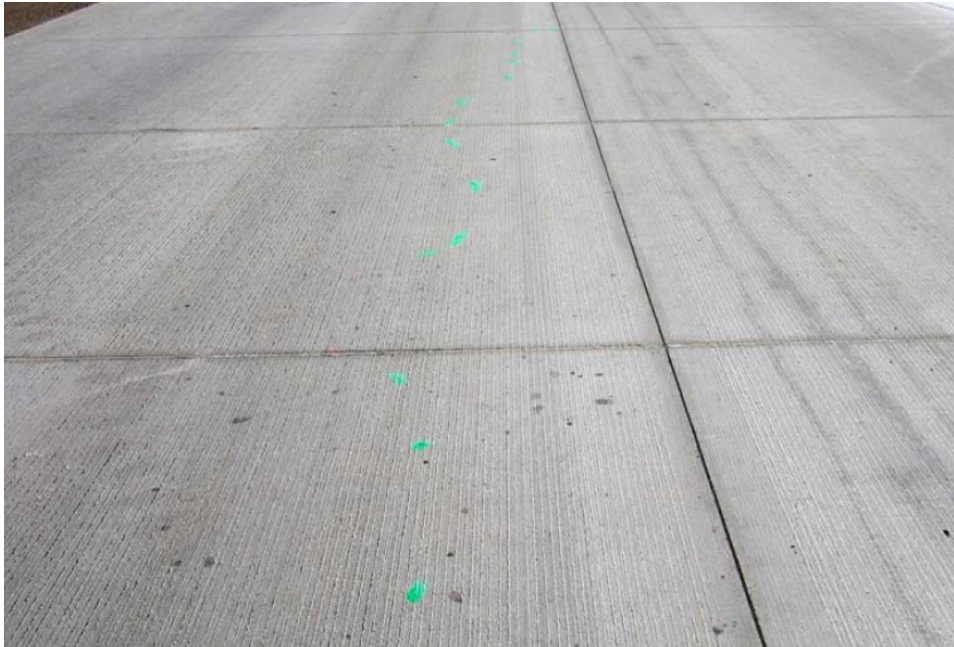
Photo. Early age longitudinal cracking on I-94 in North Dakota.
